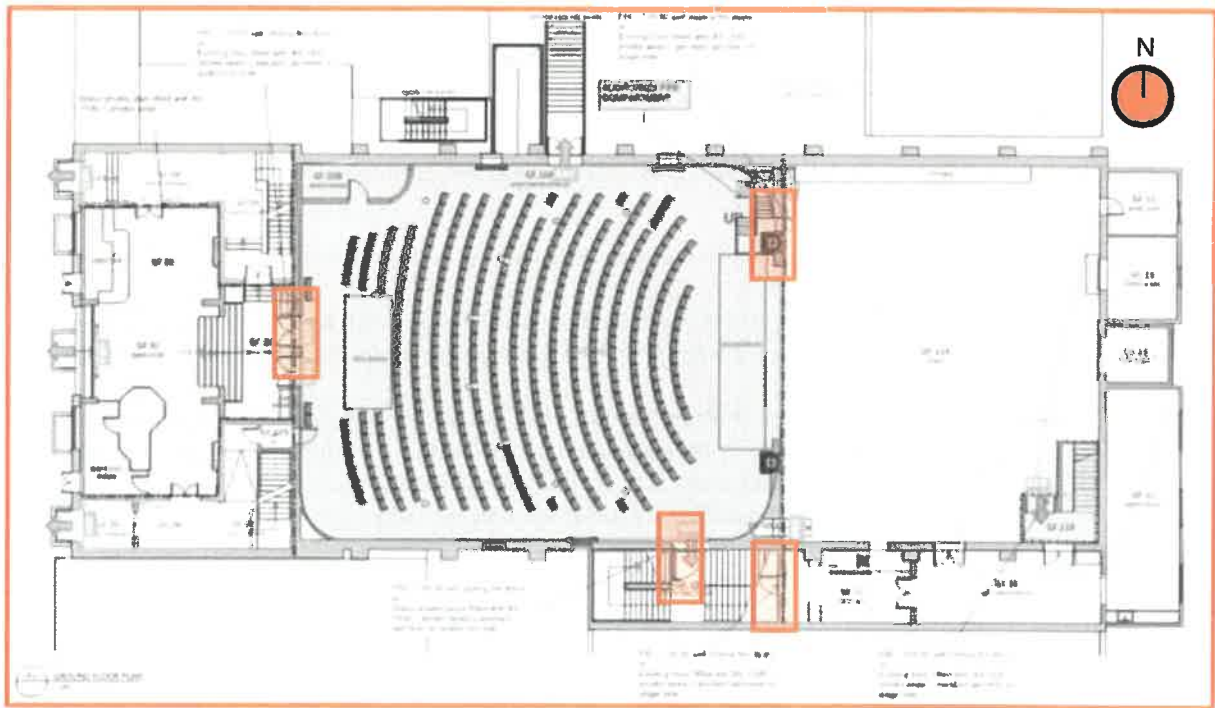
Sprinkler Protection of Existing Doors – Ground Floor
